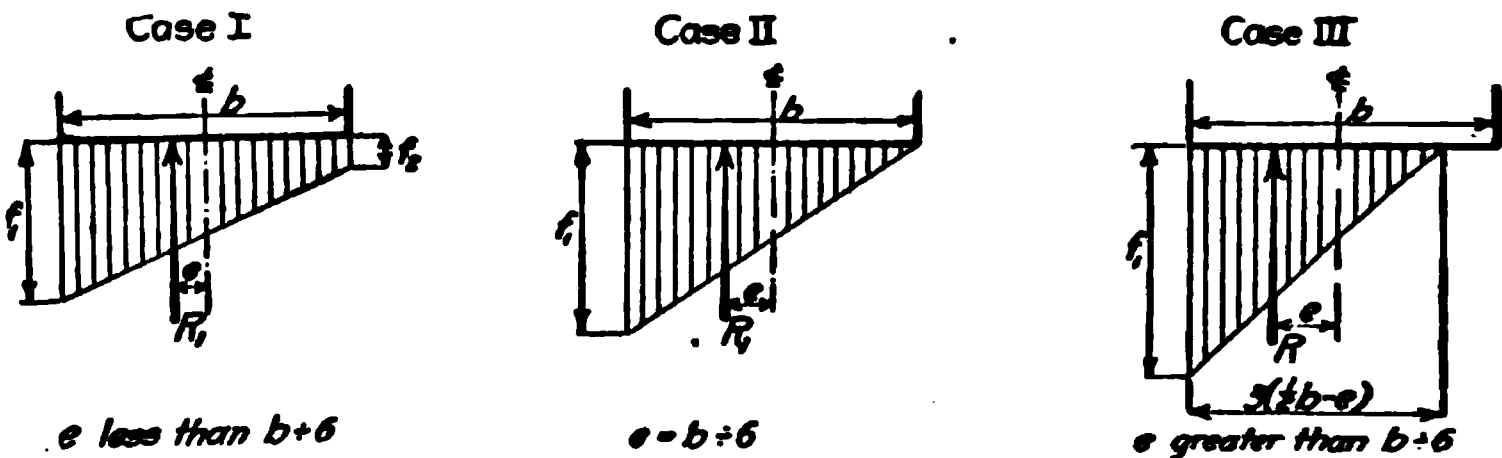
Distribution of stress on foundations eccentrically loaded.
